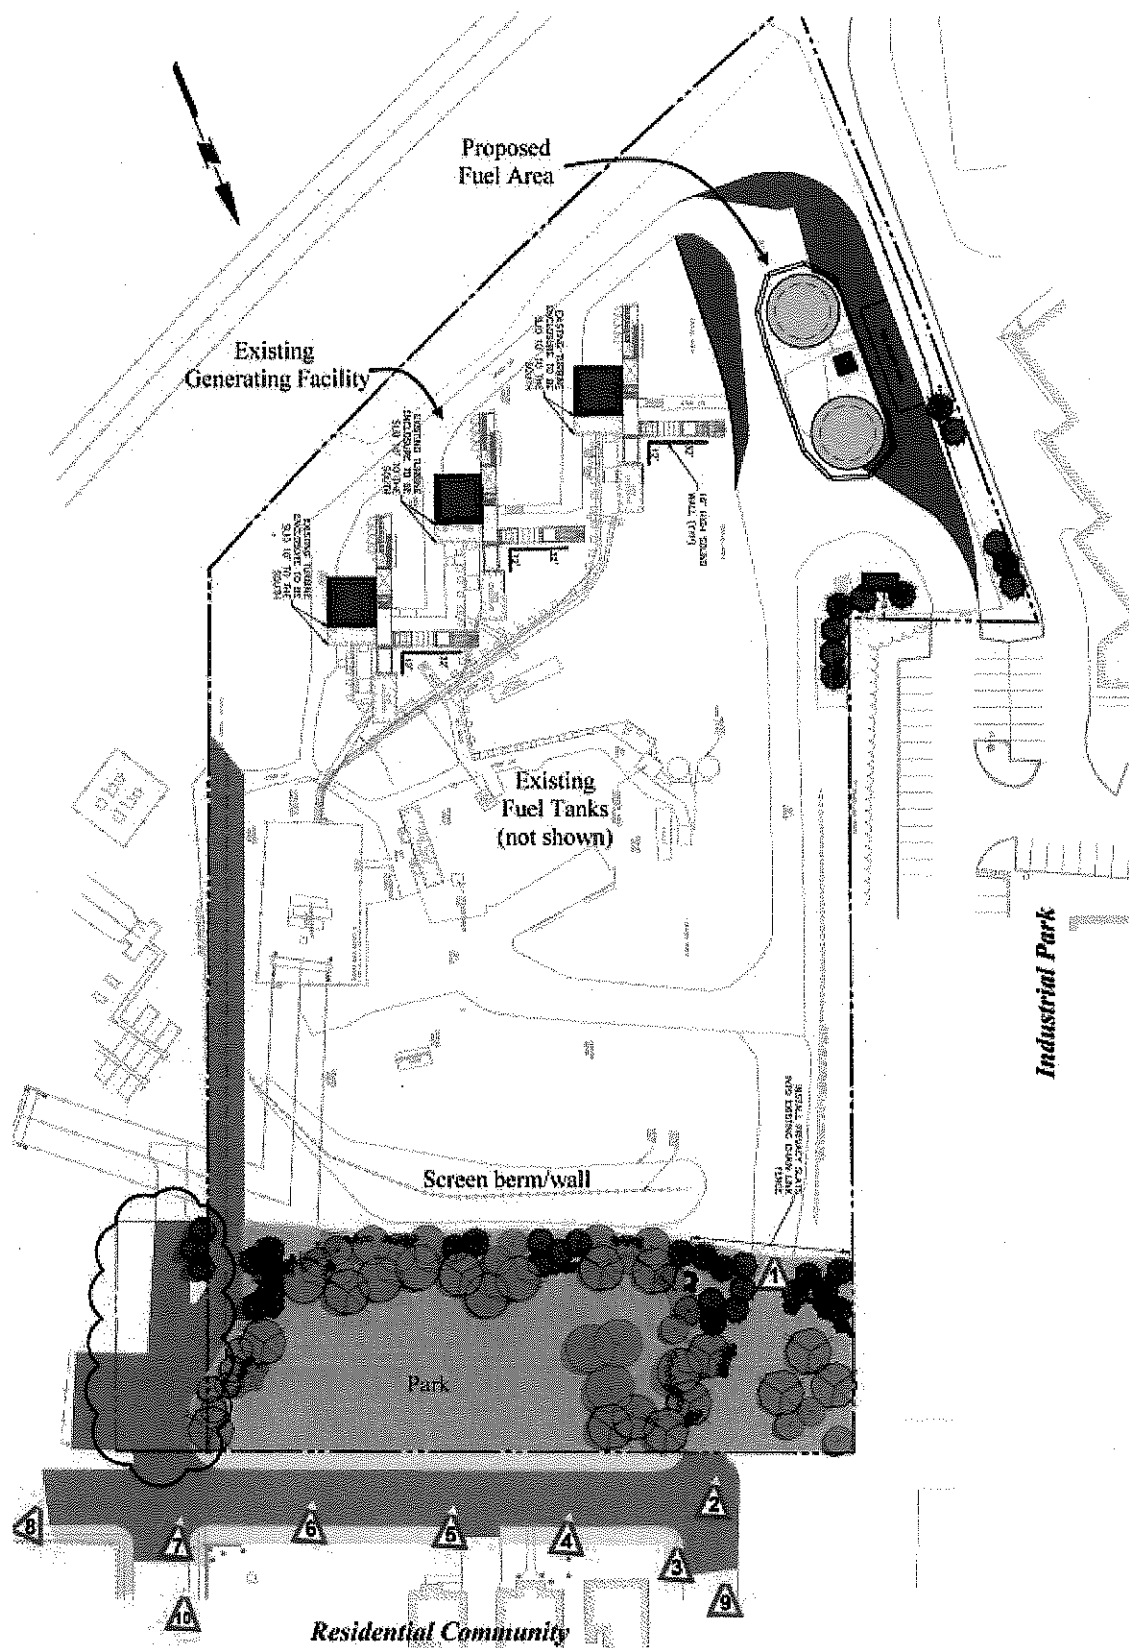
Waterside facility site plan showing existing and proposed equipment. (Waterside 1, Tab C)
